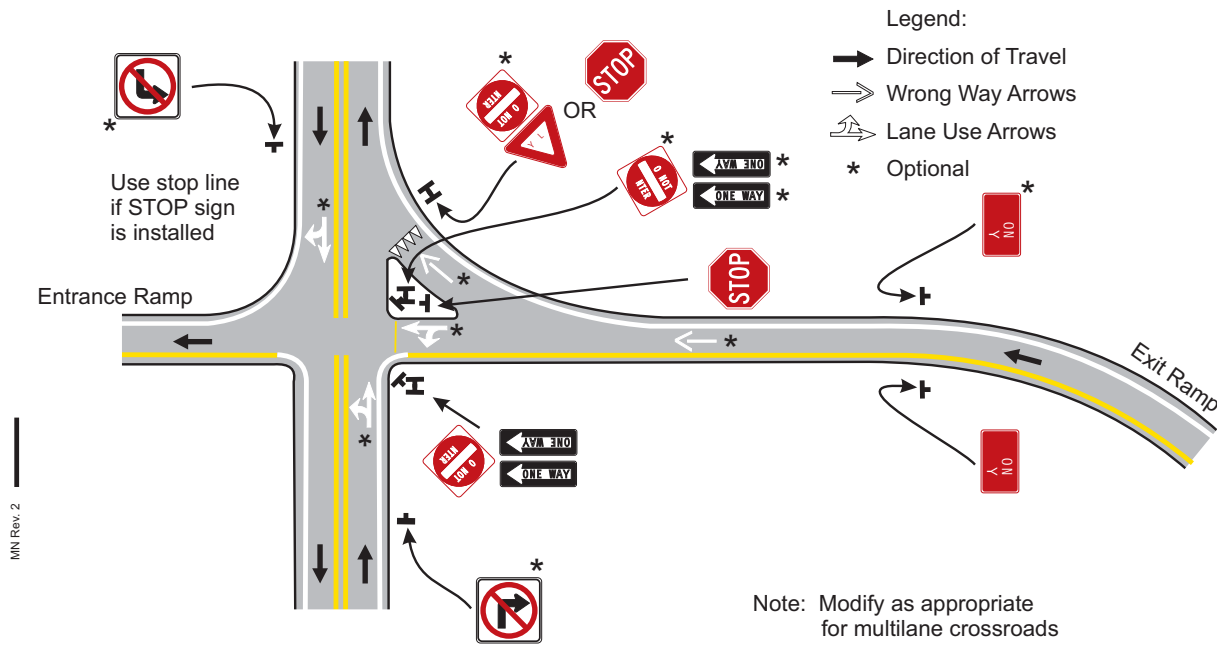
B-18. Example of Application of Regulatory Signing and Pavement Markings at an Exit Ramp Termination to Deter Wrong-Way Entry
